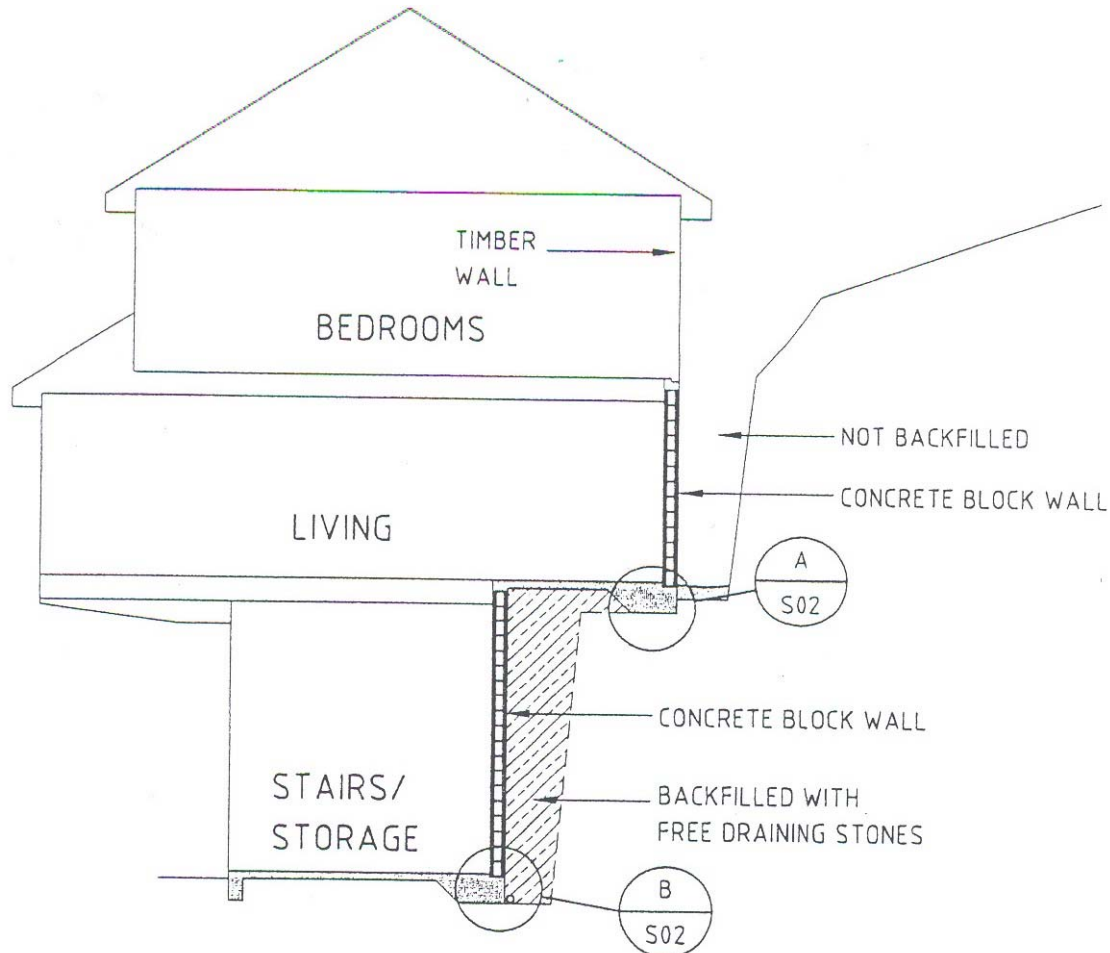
Typical as-built cross-section showing the walls (provided by the owner)
